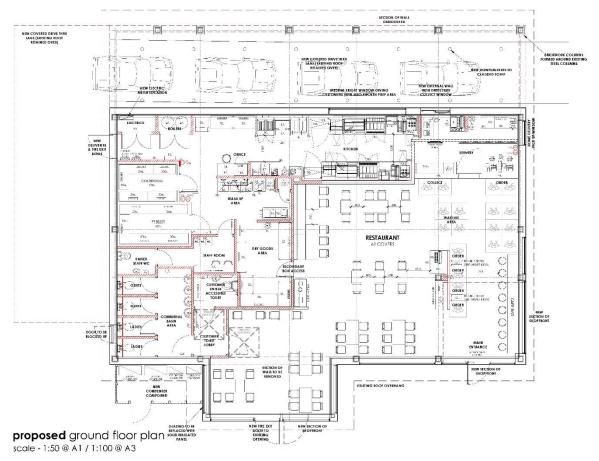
Proposed ground floor plan (2020/04/03 Rev D) (Reproduced on a not-to-scale basis)
